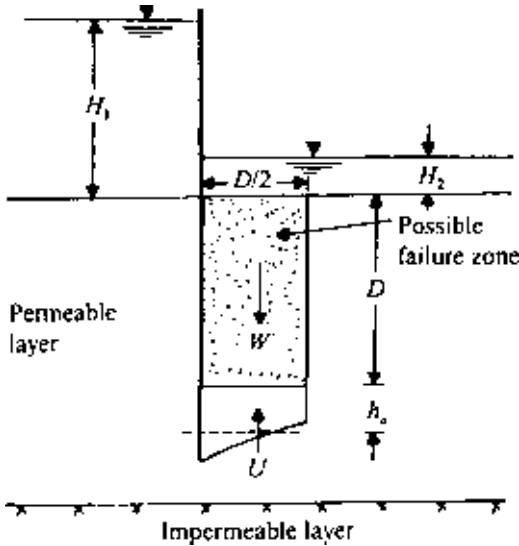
Failure due to piping for a single-row sheet pile structure.
